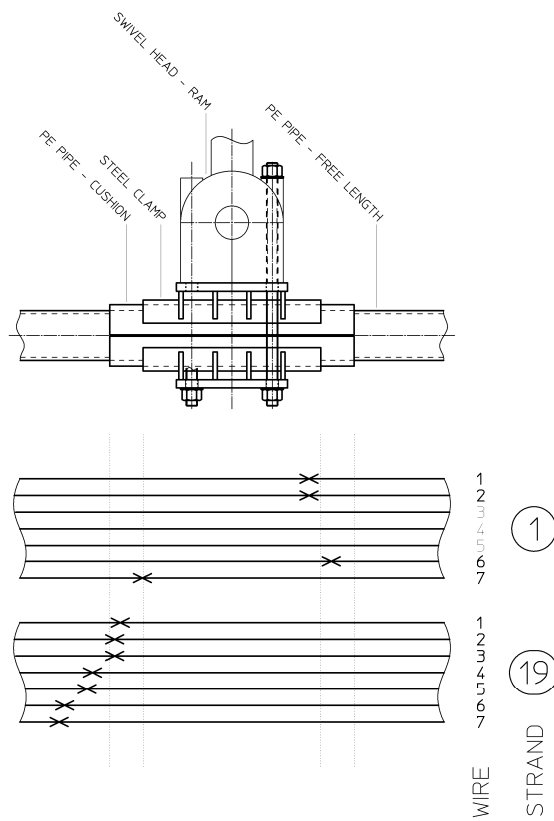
Wire Breaks at the Tower Anchorage – Specimen #1
